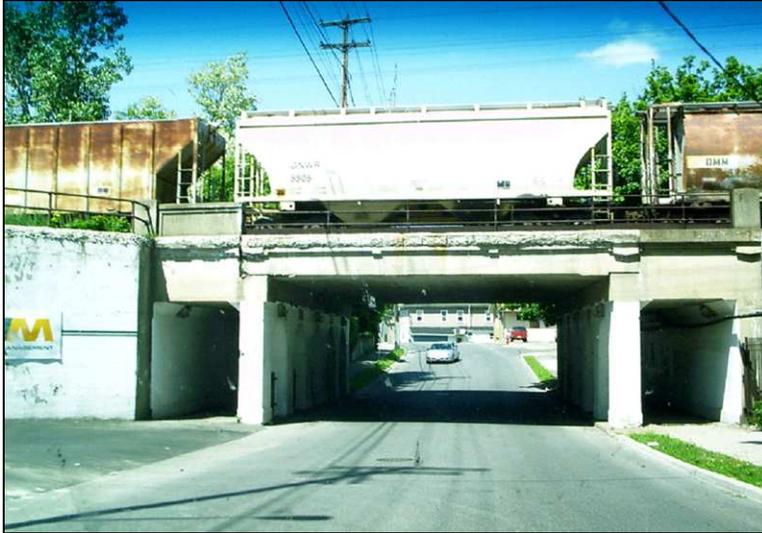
Entrance to NYSW Bulk Transload Facility on Brandywine Avenue
